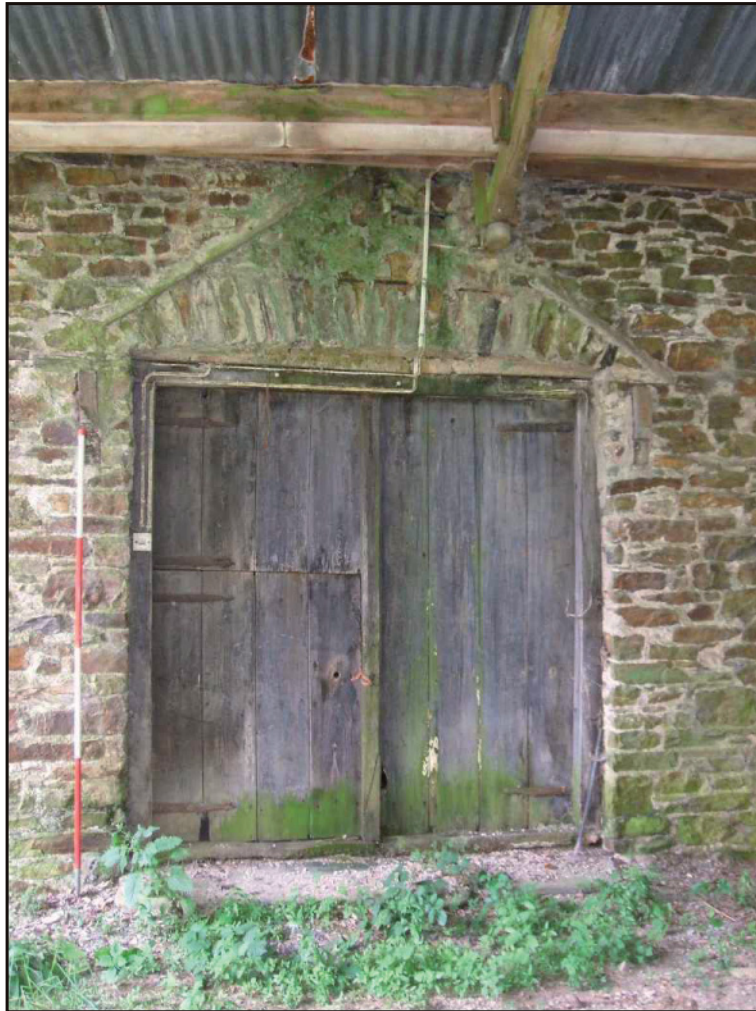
Close up view of double door opening in the north elevation at first-floor level, showing scars of porch, looking south. 2m scale.
